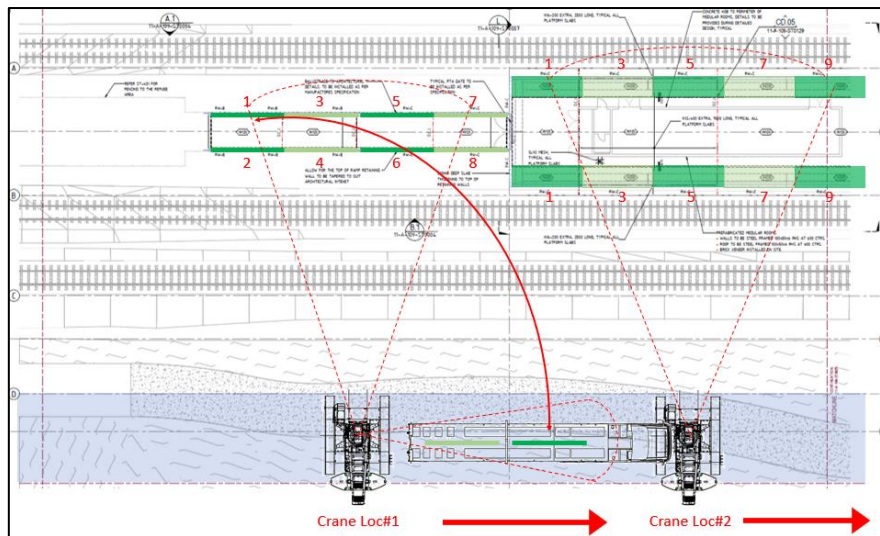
Platform Precast Panel Indicative Installation Sequence Sketch
